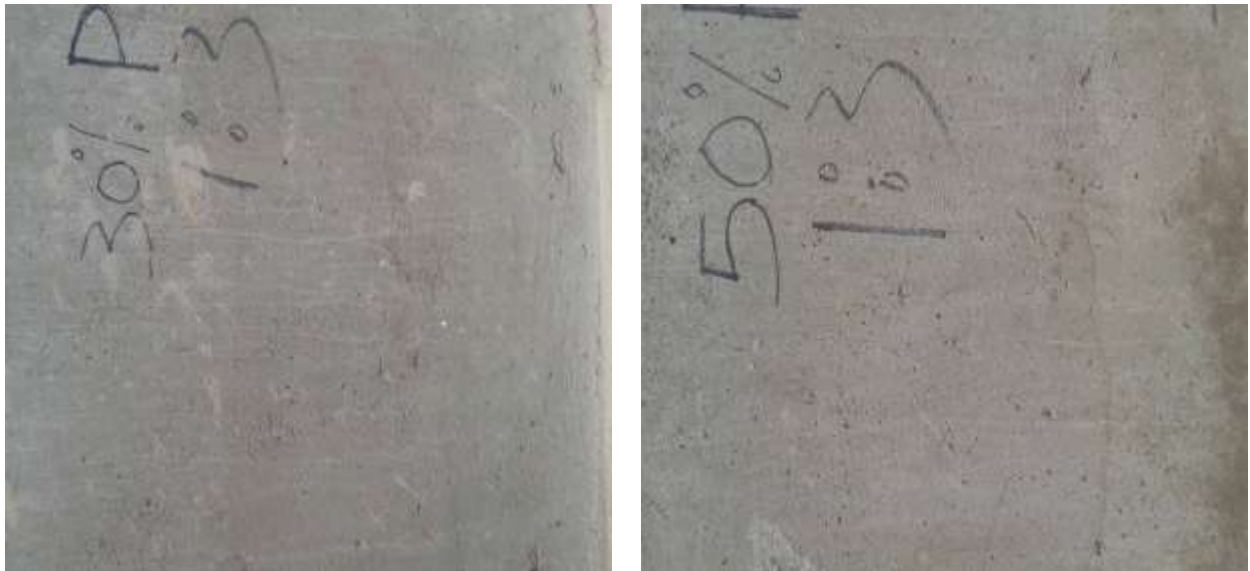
Showing walls plastered with local brewery waste at 30% and 50% cement replacement
